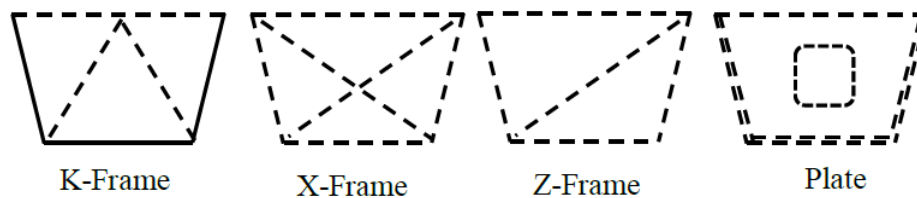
Internal Intermediate Cross-Frame Layouts, Tub Girders (Helwig and Yura 2012)
